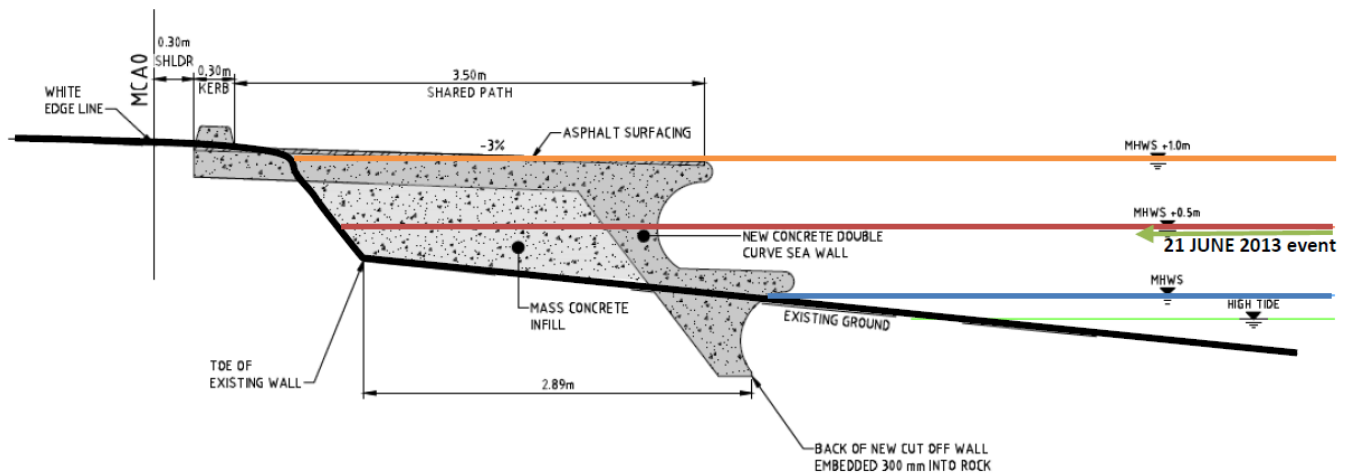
Schematic of existing seawall along with proposed seawall at Point Howard Beach showing MHWs elevation after periods of sea-level rise.
